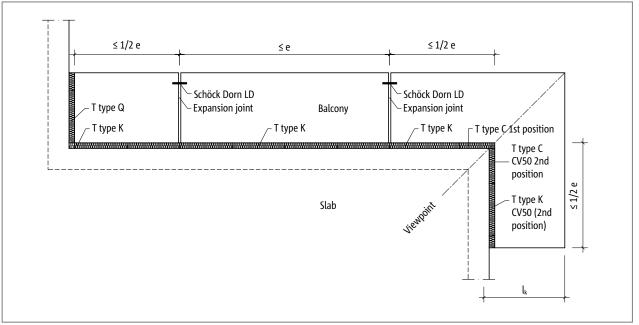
Schöck Isokorb® T type C: Expansion joint spacing
